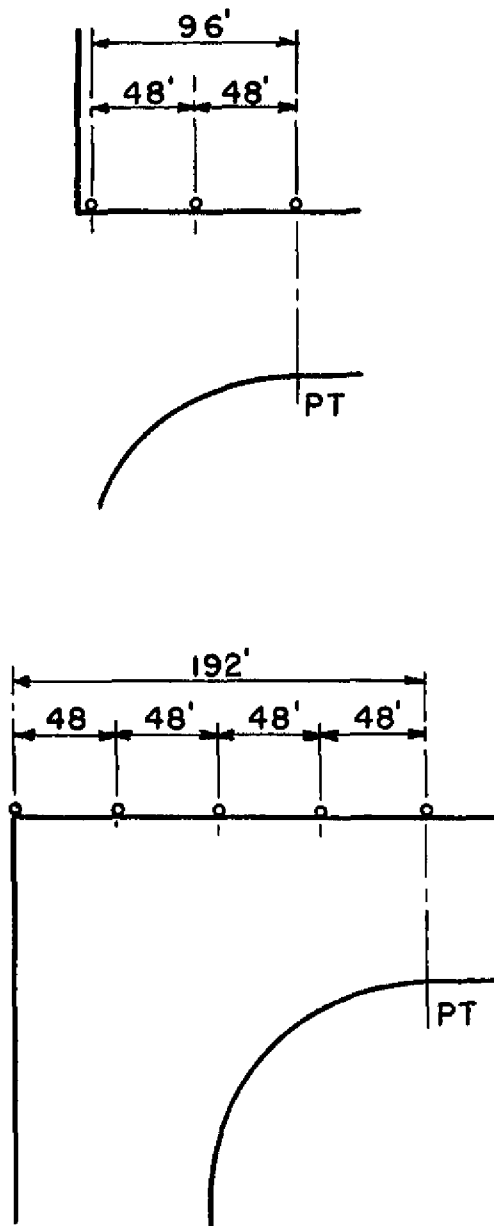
TYPICAL EXAMPLES SINGLE STRAIGHT EDGES - LESS THAN 200 FEET
